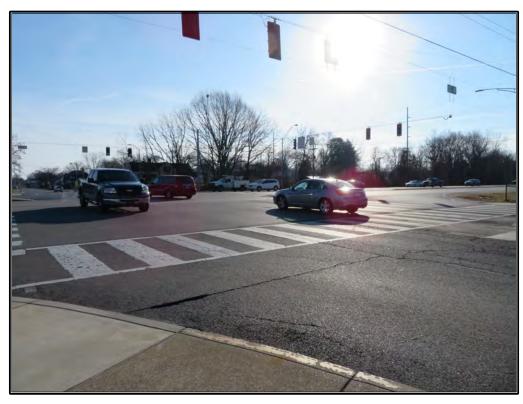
Overview of project area at the intersection of US 41 and Washington Avenue, facing southeast.
